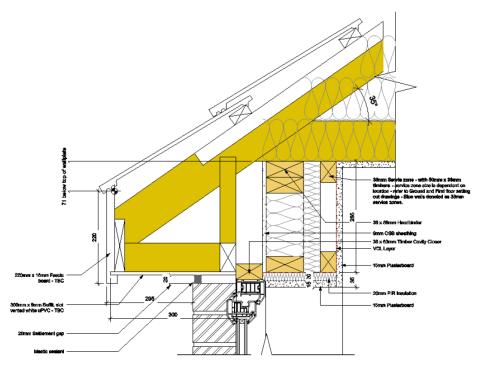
E10 (drawing 20-AC-01) unfilled cavity – materials legend
